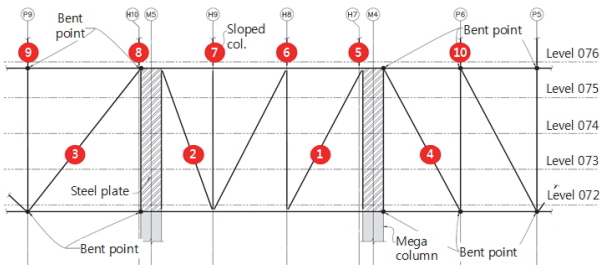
Collapse member scenario of belt truss 1 (L072-L076)
